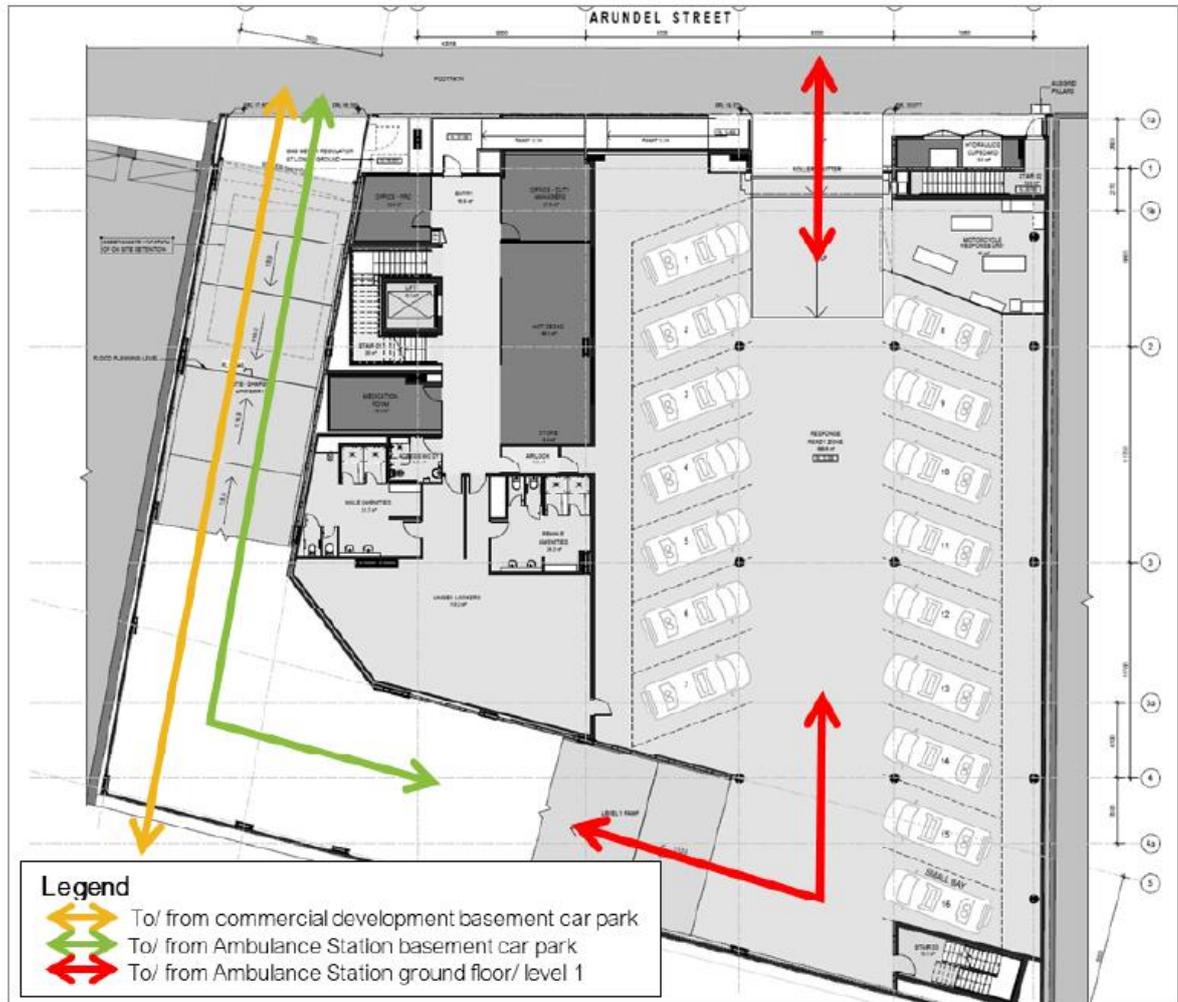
Ambulance station ground floor illustrating proposed access arrangements
